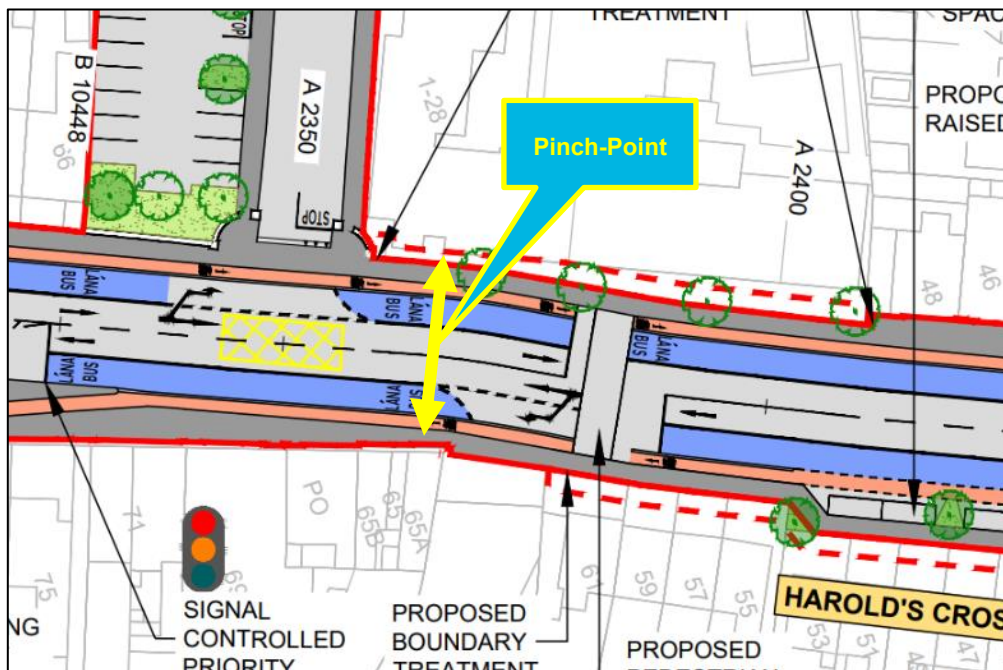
Extract from General Arrangement Map Sheet 7 at Pinch-Point
